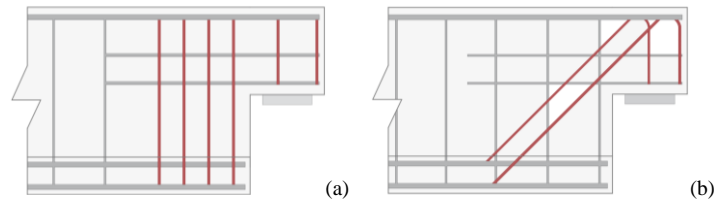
Reinforcement layout of the dapped-end beam specimens: (a) Beam A; (b) Beam B.
